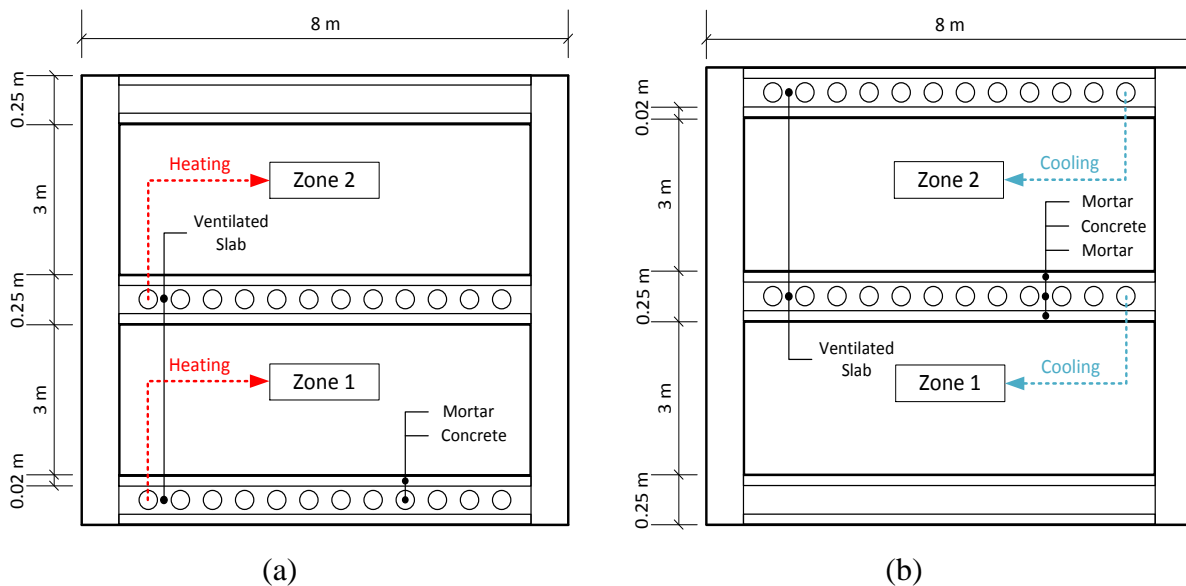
A section view of the building slab and exterior walls for two thermal zones used for the verification analysis: (a) ventilated heating slab and (b) ventilated cooling slab
